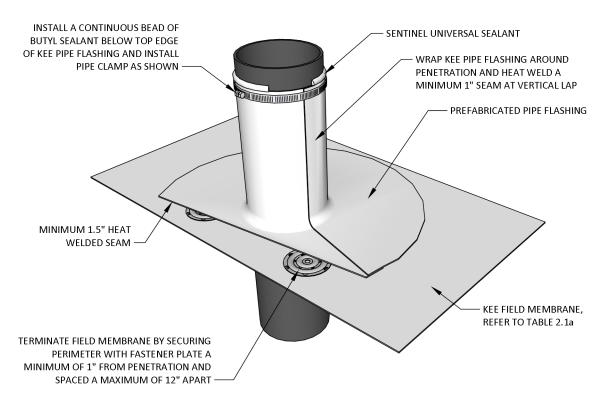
Adhered KEE Field Membrane at Penetration With Prefabricated Pipe Flashing
